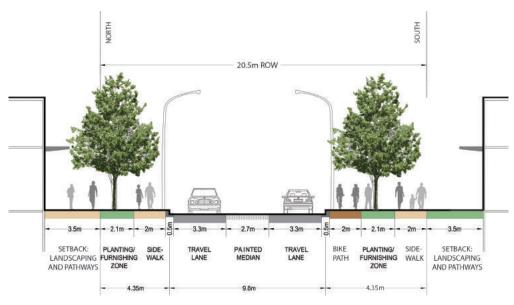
Street Type B2 (Southwest Entrance - Narrow)
